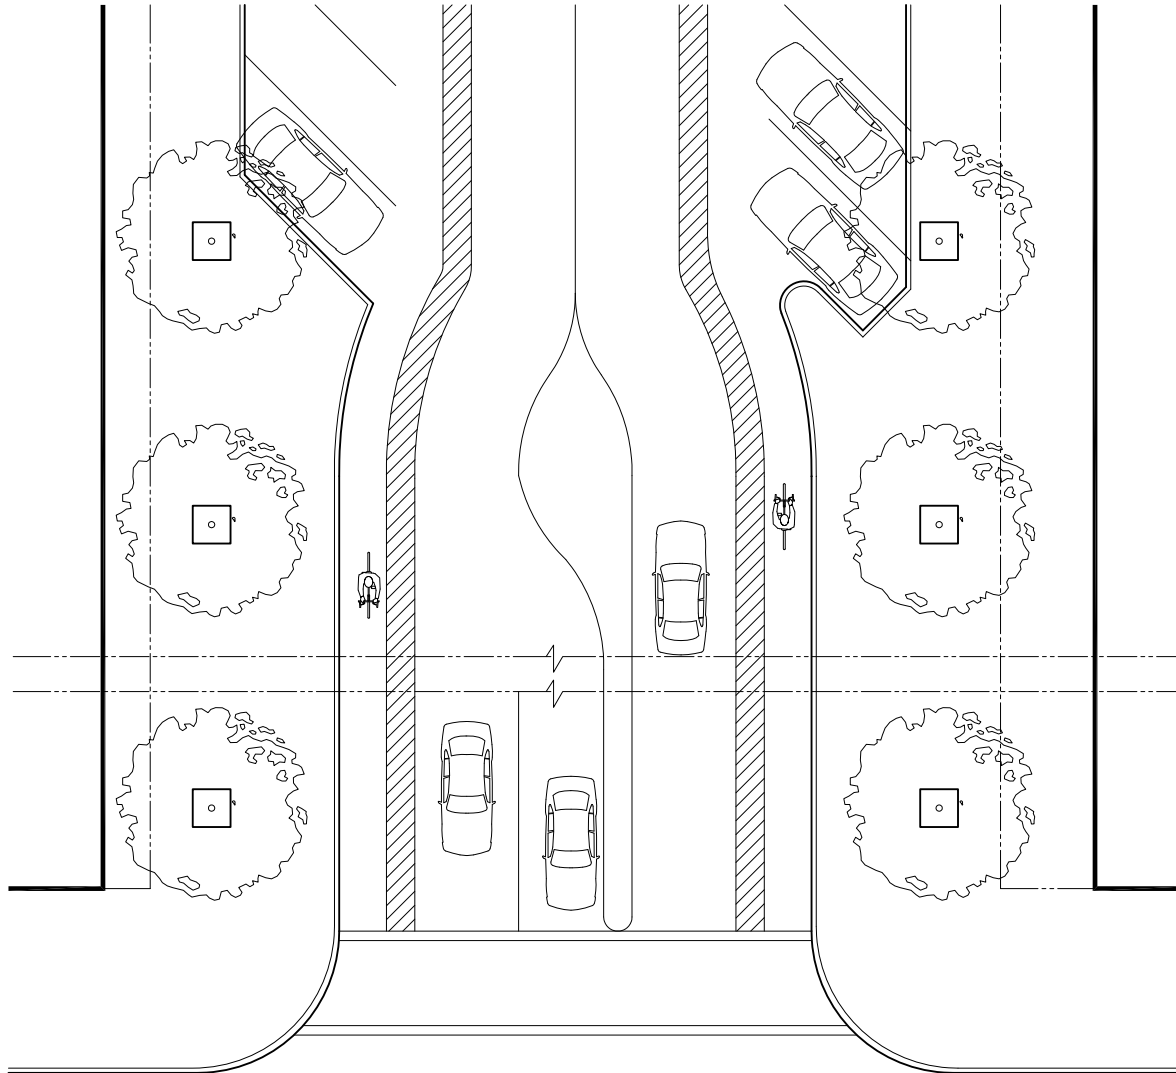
Street Type 1: Typical Intersection (Plan View)
